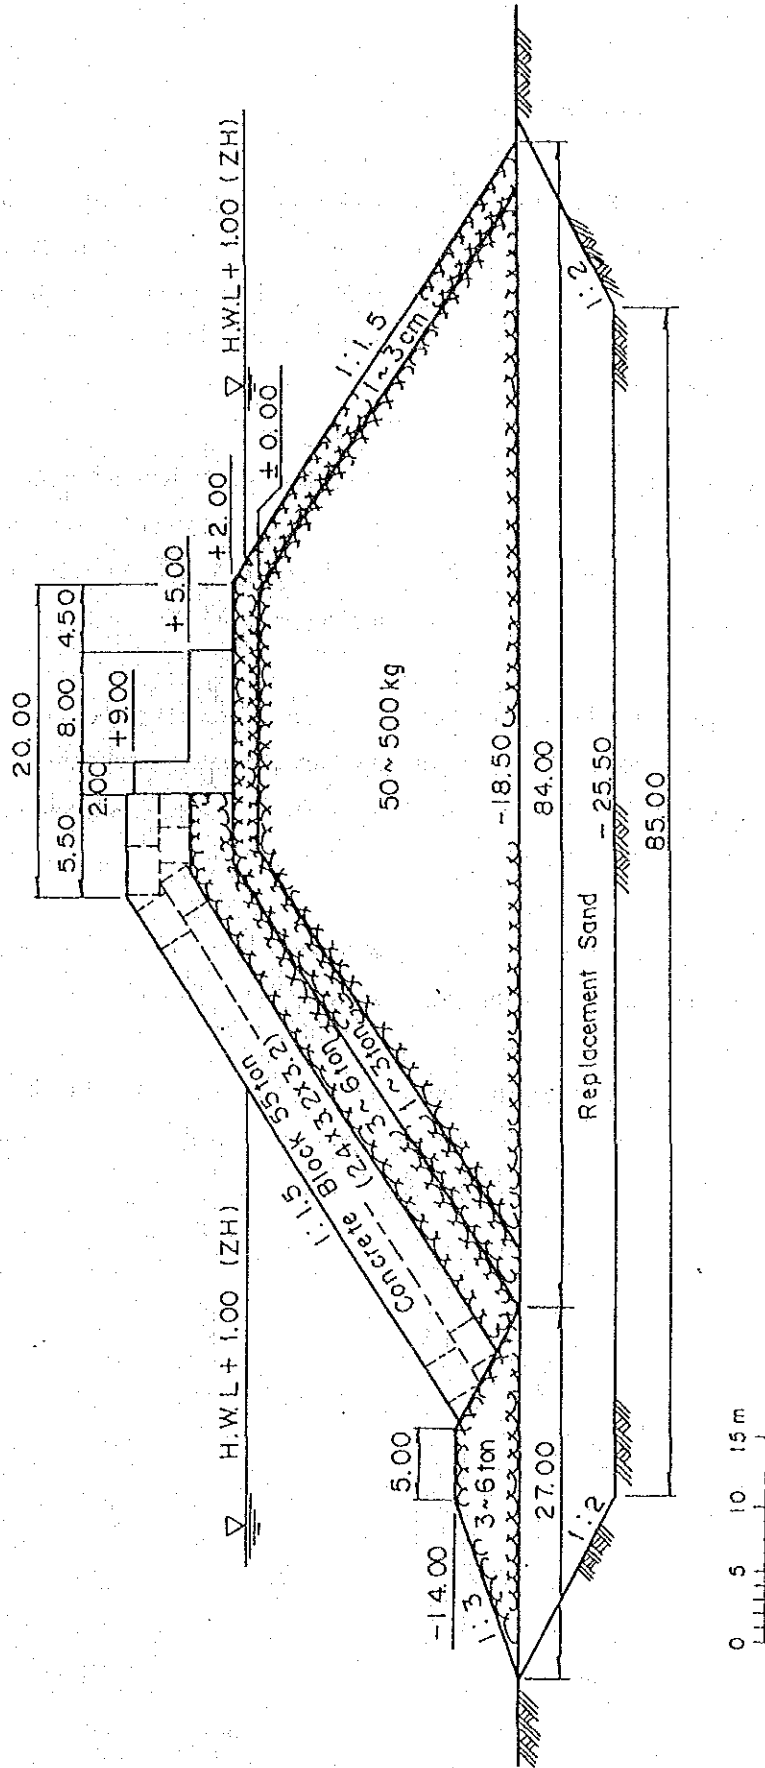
Typical Cross Section of North Main Breakwater
